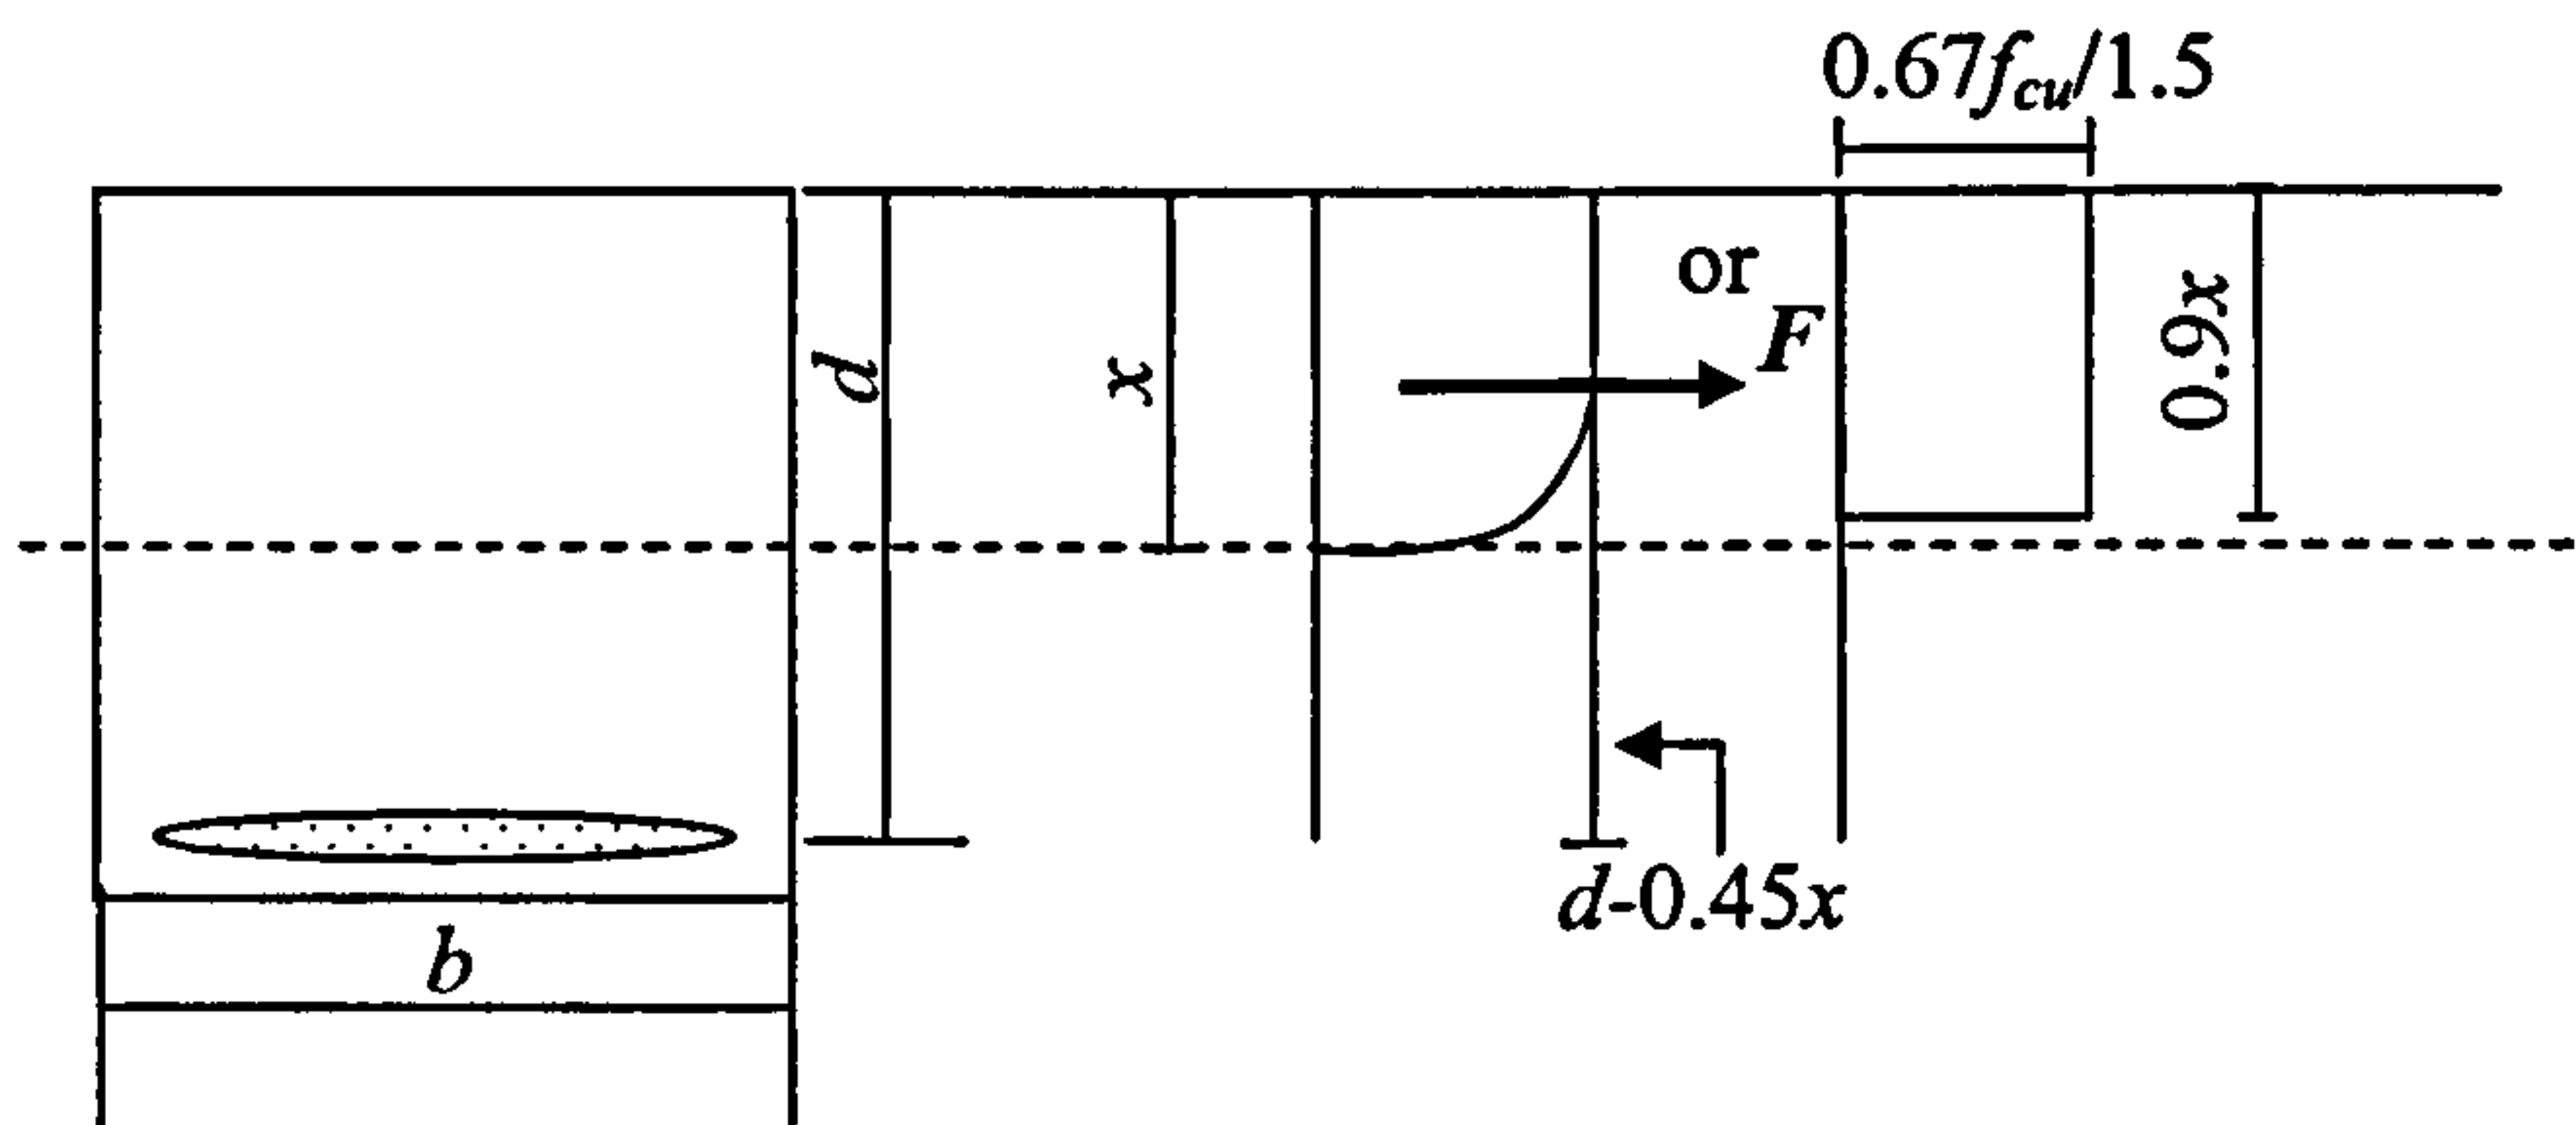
Reinforced concrete beam stress block (Fig. 3.3 BS8110)
